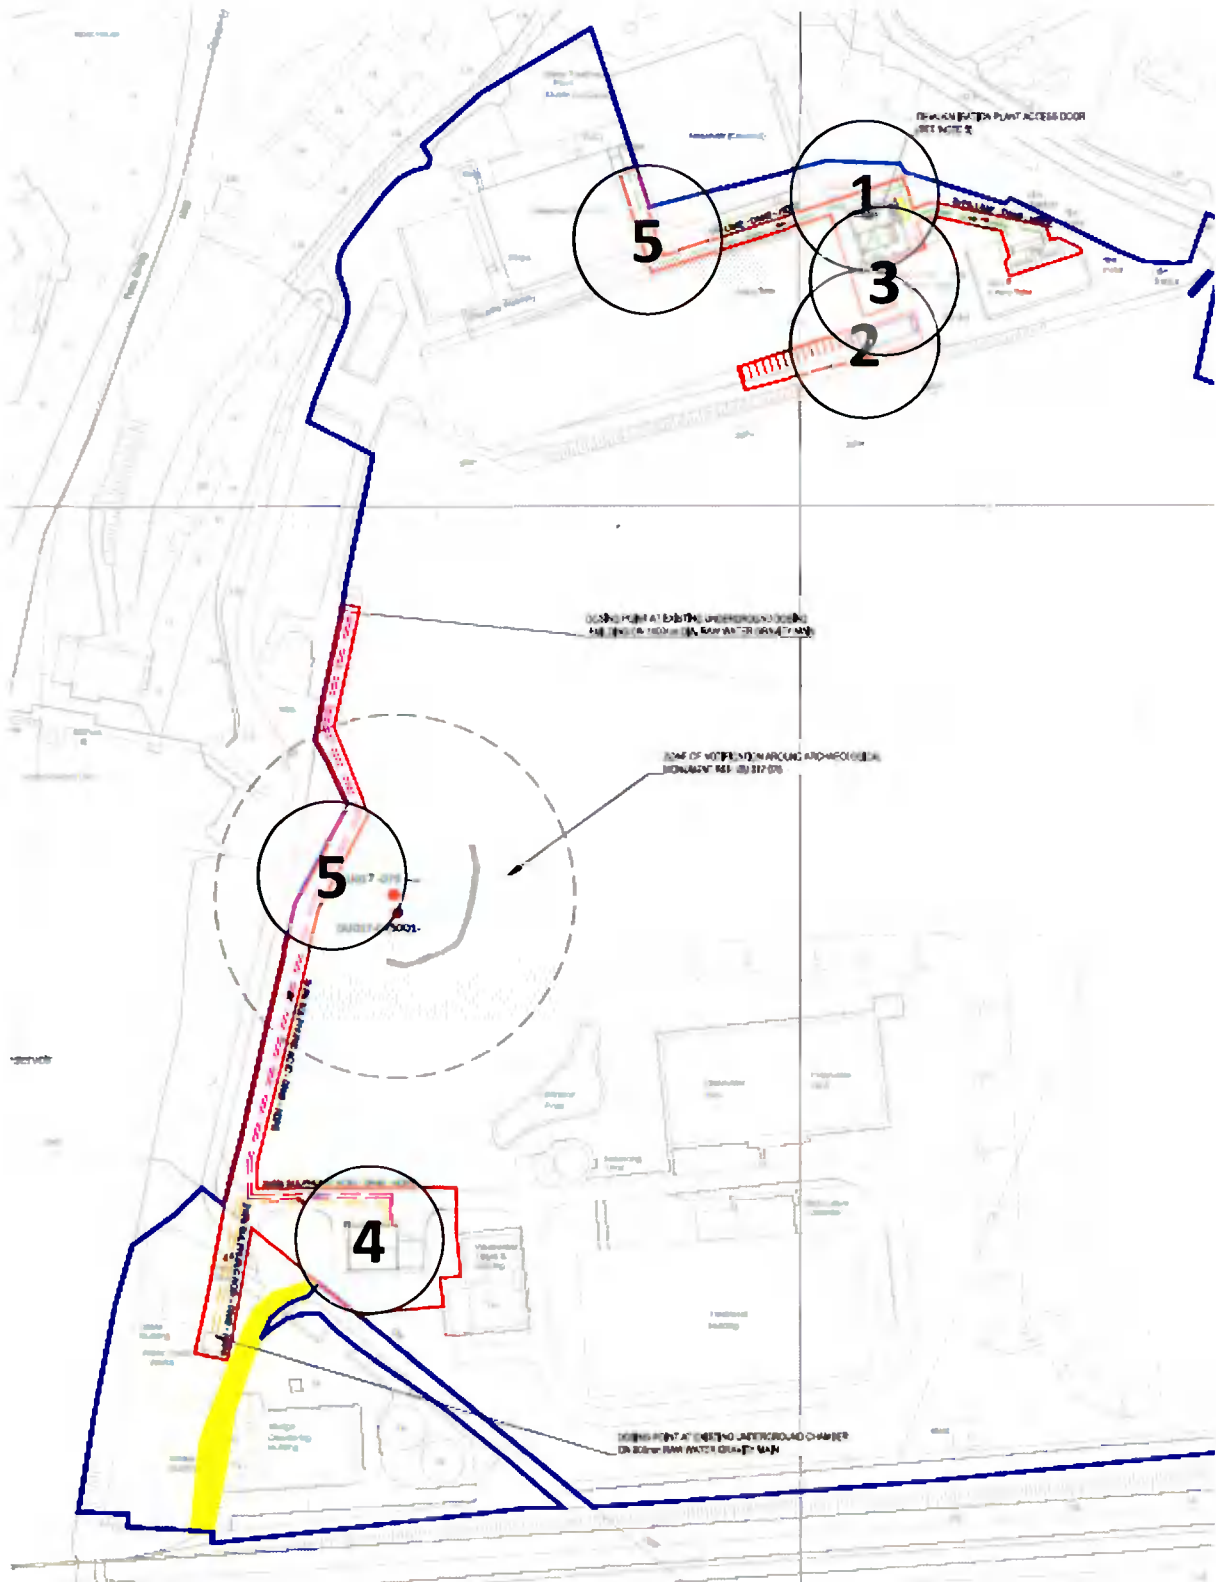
Site Layout Illustrating Elements of the Proposed Development - Planning Drawing No. 11118-RHL-LP2-XX-DR-PL-0003
